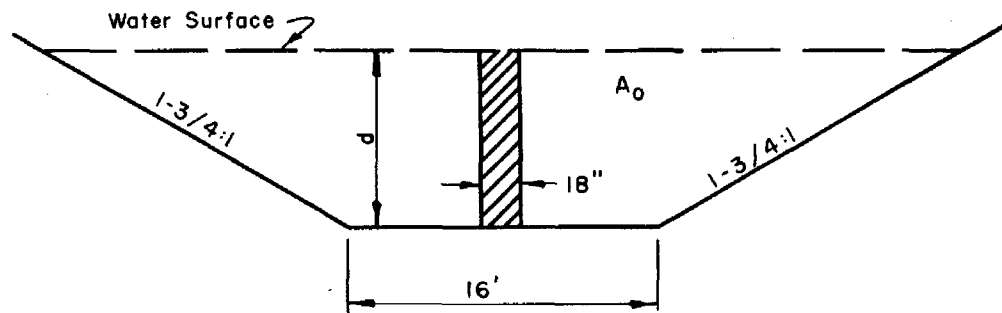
Cross-section of channel showing center bridge pier.
